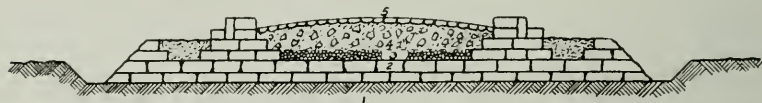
Cross-section of The Appian Way—1, Solid subsoil; 2, Flat stone laid in mortar; 3, Well beaten Rubble; 4, Gravel or broken stone and lime; 5, Stone blocks fitted into place
